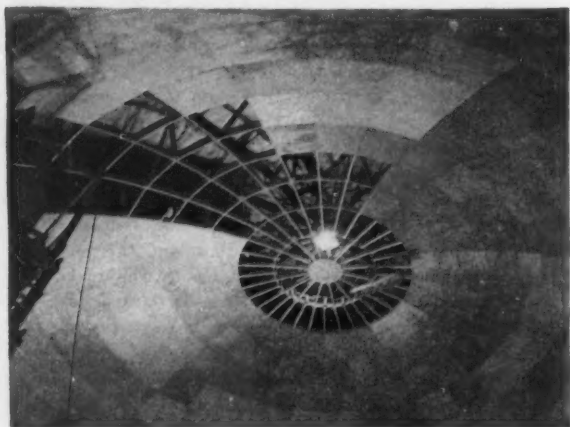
and 3 Internal and external view of prefabricated timber workshop at Stillington
